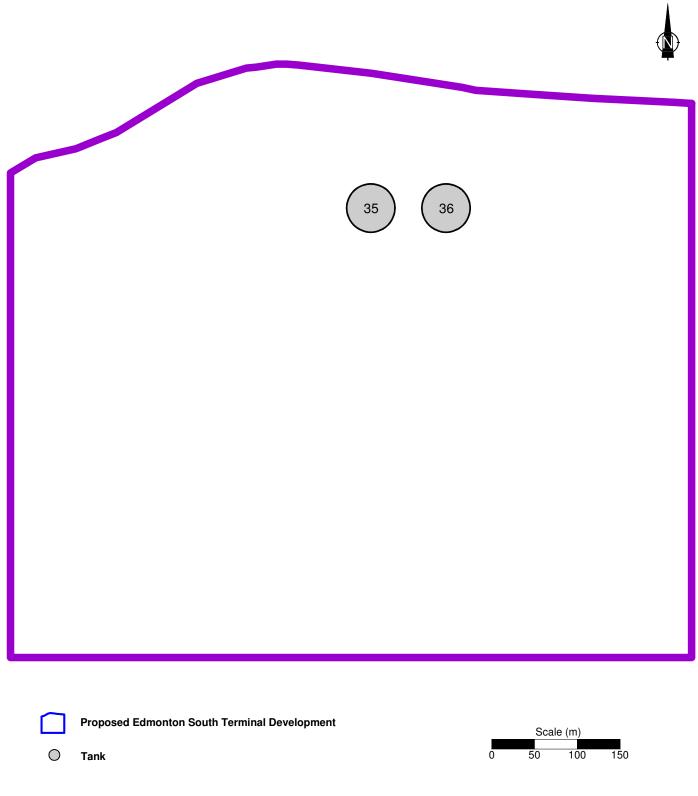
Simplified Plot Plan of the Enbridge Edmonton South Terminal Development.
